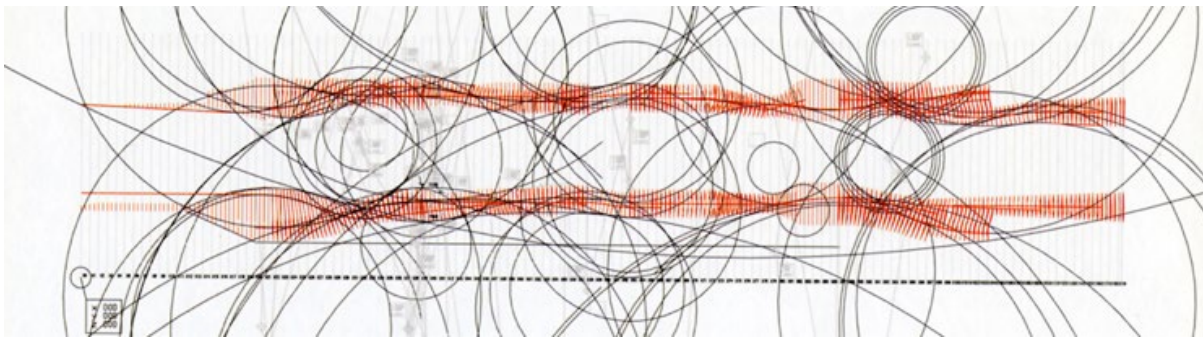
Foreign Office Architects, Determination of Girder Geometry, Osanbashi Pier, Yokohama, Japan, 1995 - 2002¹⁶
